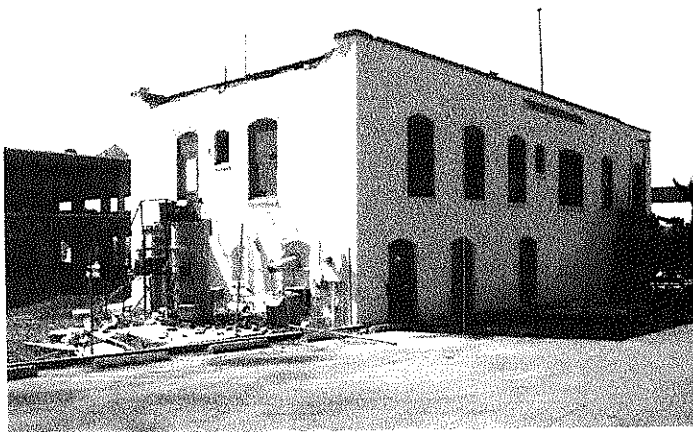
Damage to an unreinforced masonry building. In addition to the obvious parapet damage, walls in this building were badly cracked, and the building was posted Unsafe.
